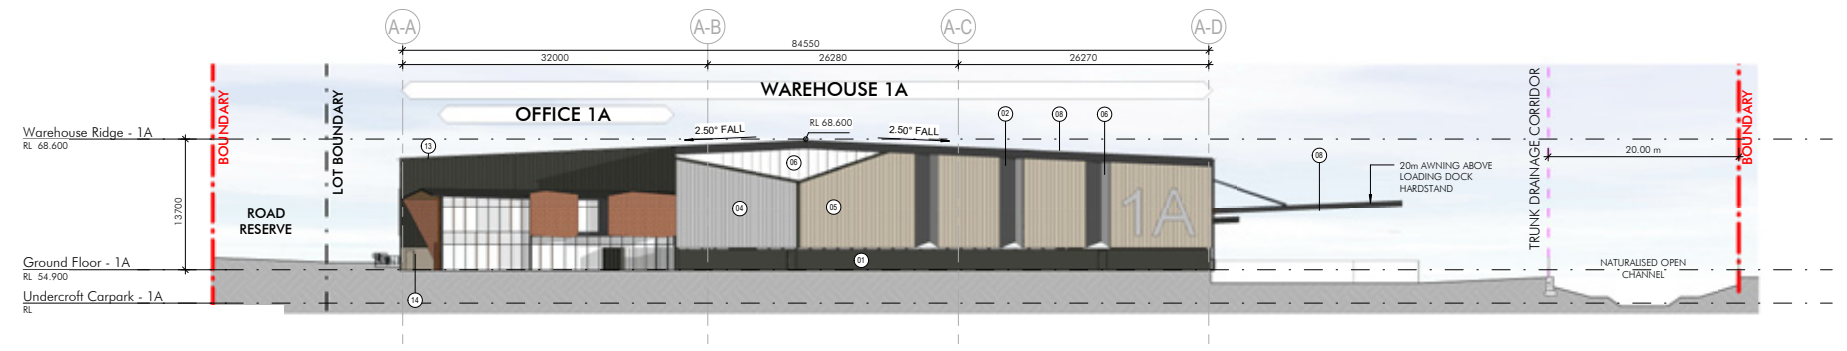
Warehouse 1A – East Elevation (Aldington Road, Frontage)
